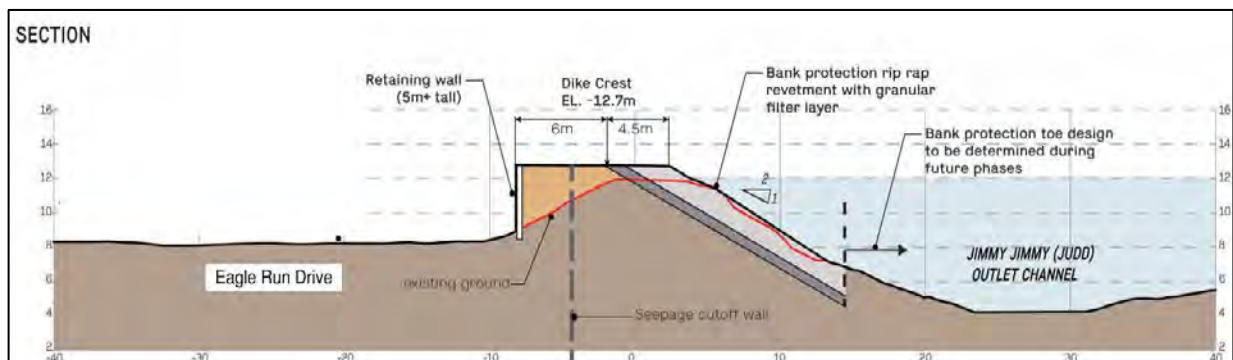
Eagle Run Drive Existing Dike Upgrade (ERD) Typical Cross-section
